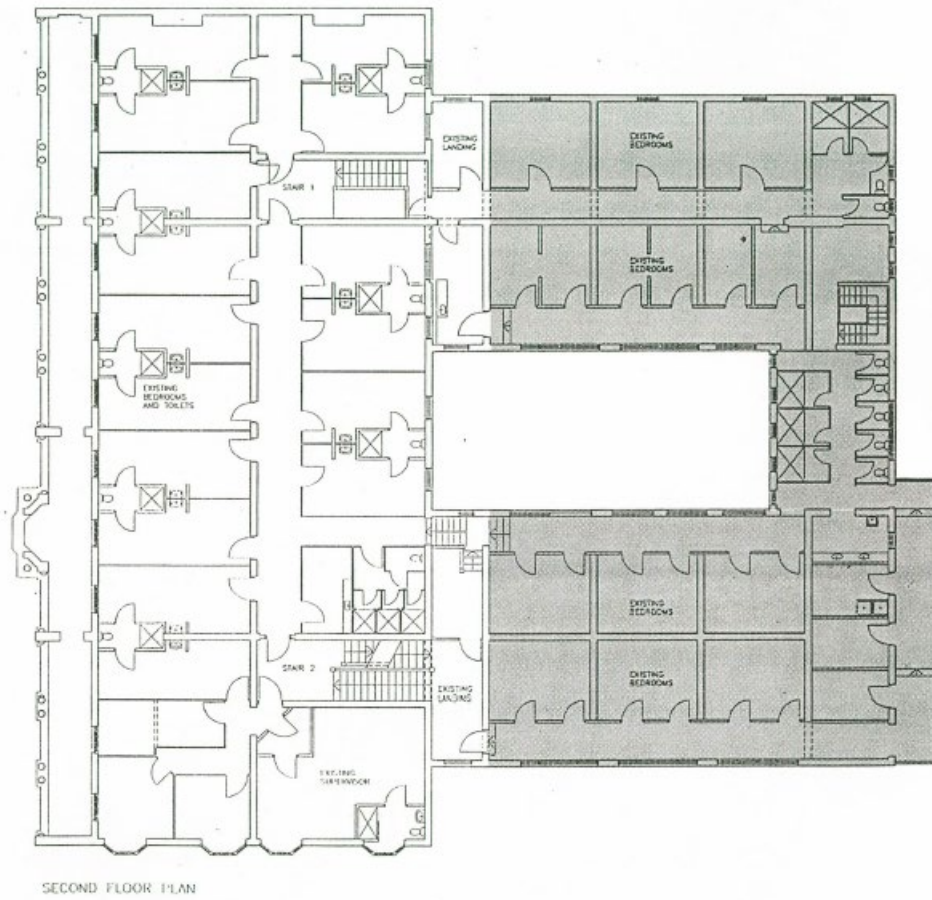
1996 floor plan of the upper level of Garcia (Level 5 on Leaf Architects documentation) showing the layout of the rooms with ensuites.
